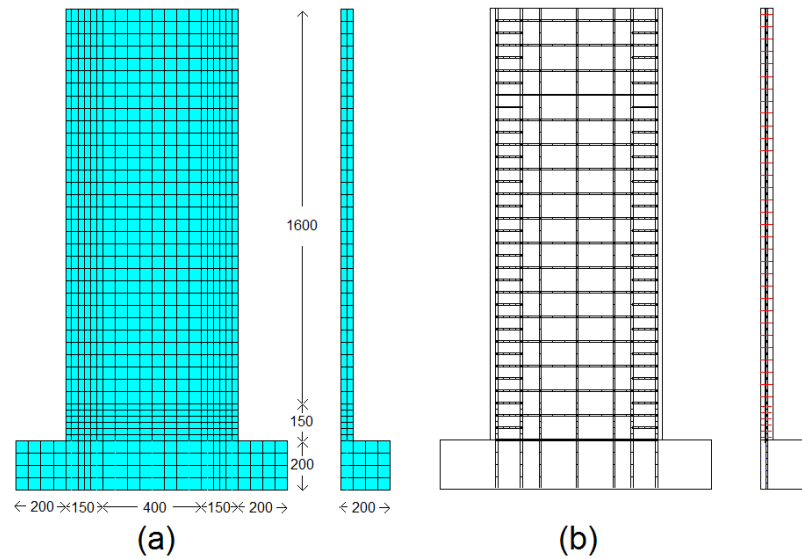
Details of the FE model FE-ZSW7 (a) elements mesh (b) elements arrangement
